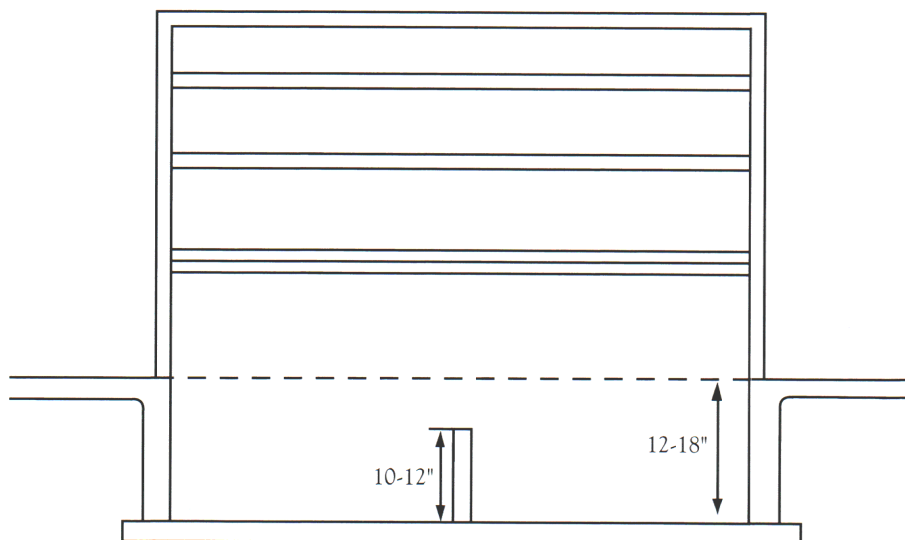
Full width gutter under farrowing crate or stall with center "flow straightener."
